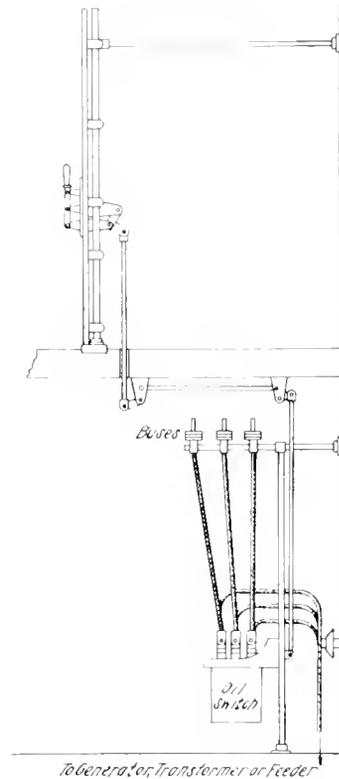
Busses and Oil-Switches on Frame-work below Floor of Switchboard Room
